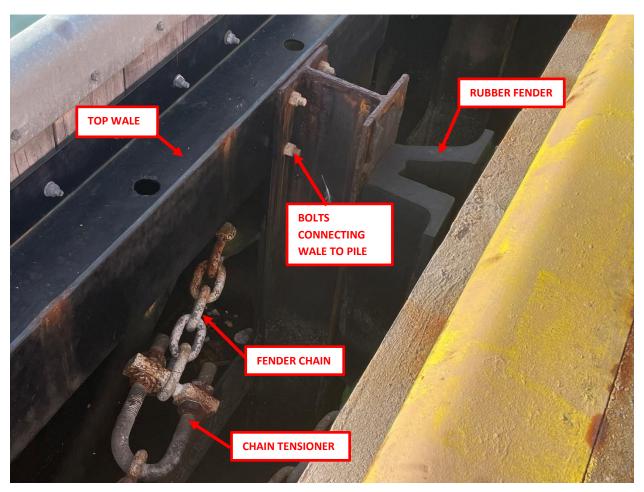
Typical Condition of Wale. Also note Typical Condition of top fender chain.
